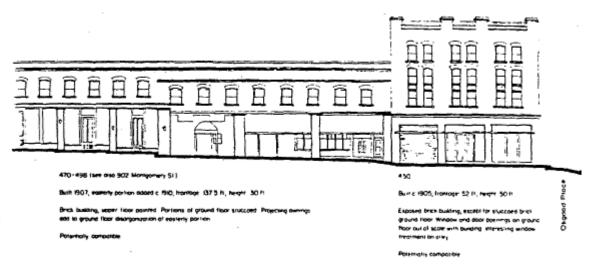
Façade elevations and architectural description diagram for the block of the subject building (subject building at right). Source: Jackson Square Report.
